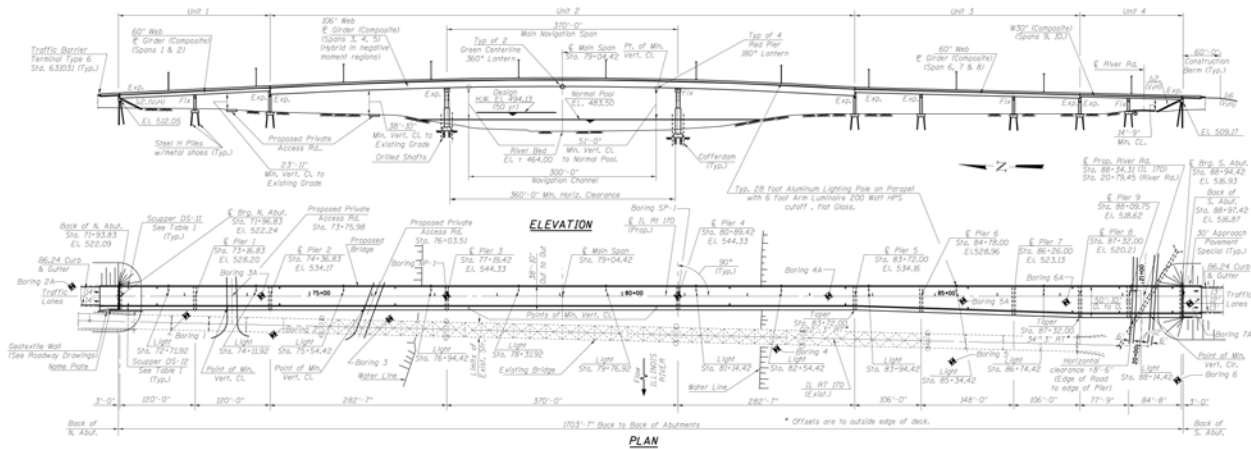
Plan & Elevation of Proposed IL-170 Bridge
